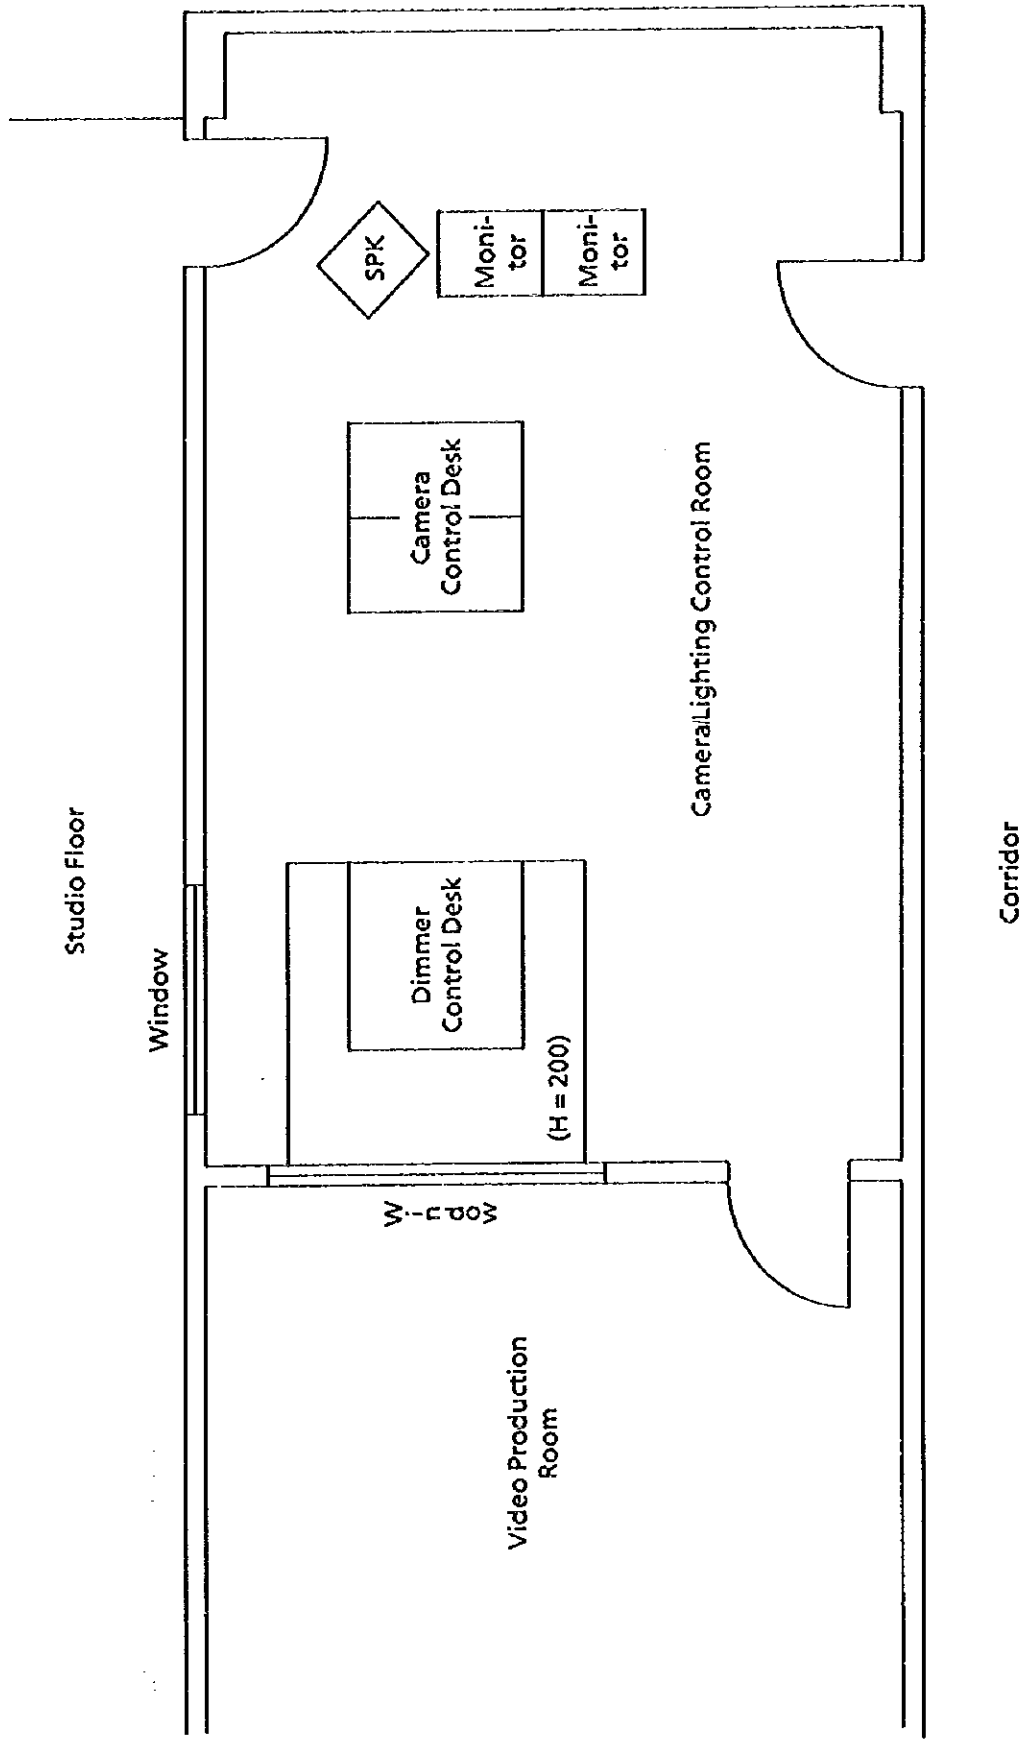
Equipment layout of Camera/Lighting Control Room
